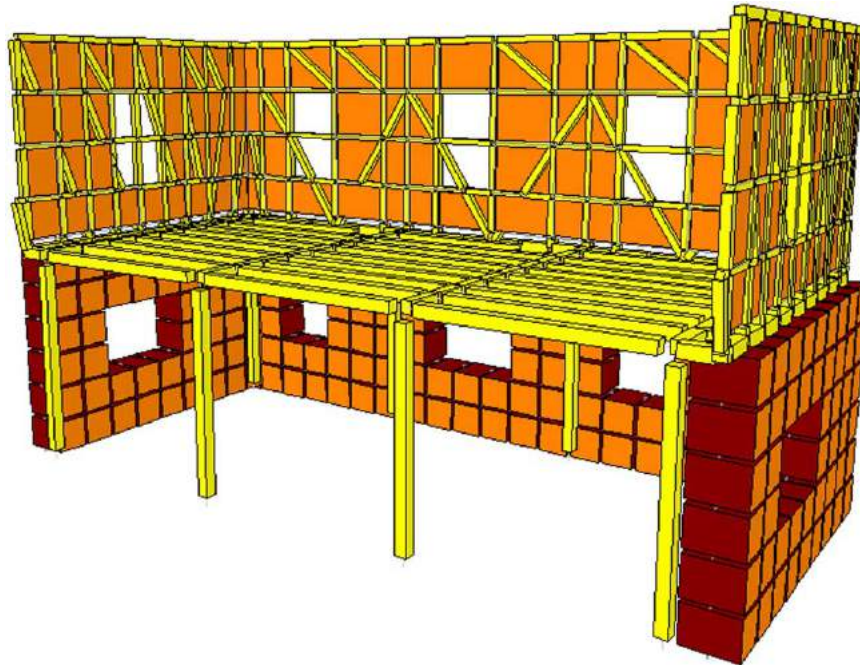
Section of Finite Element model of traditional dual system structural building (façade elements not shown).
